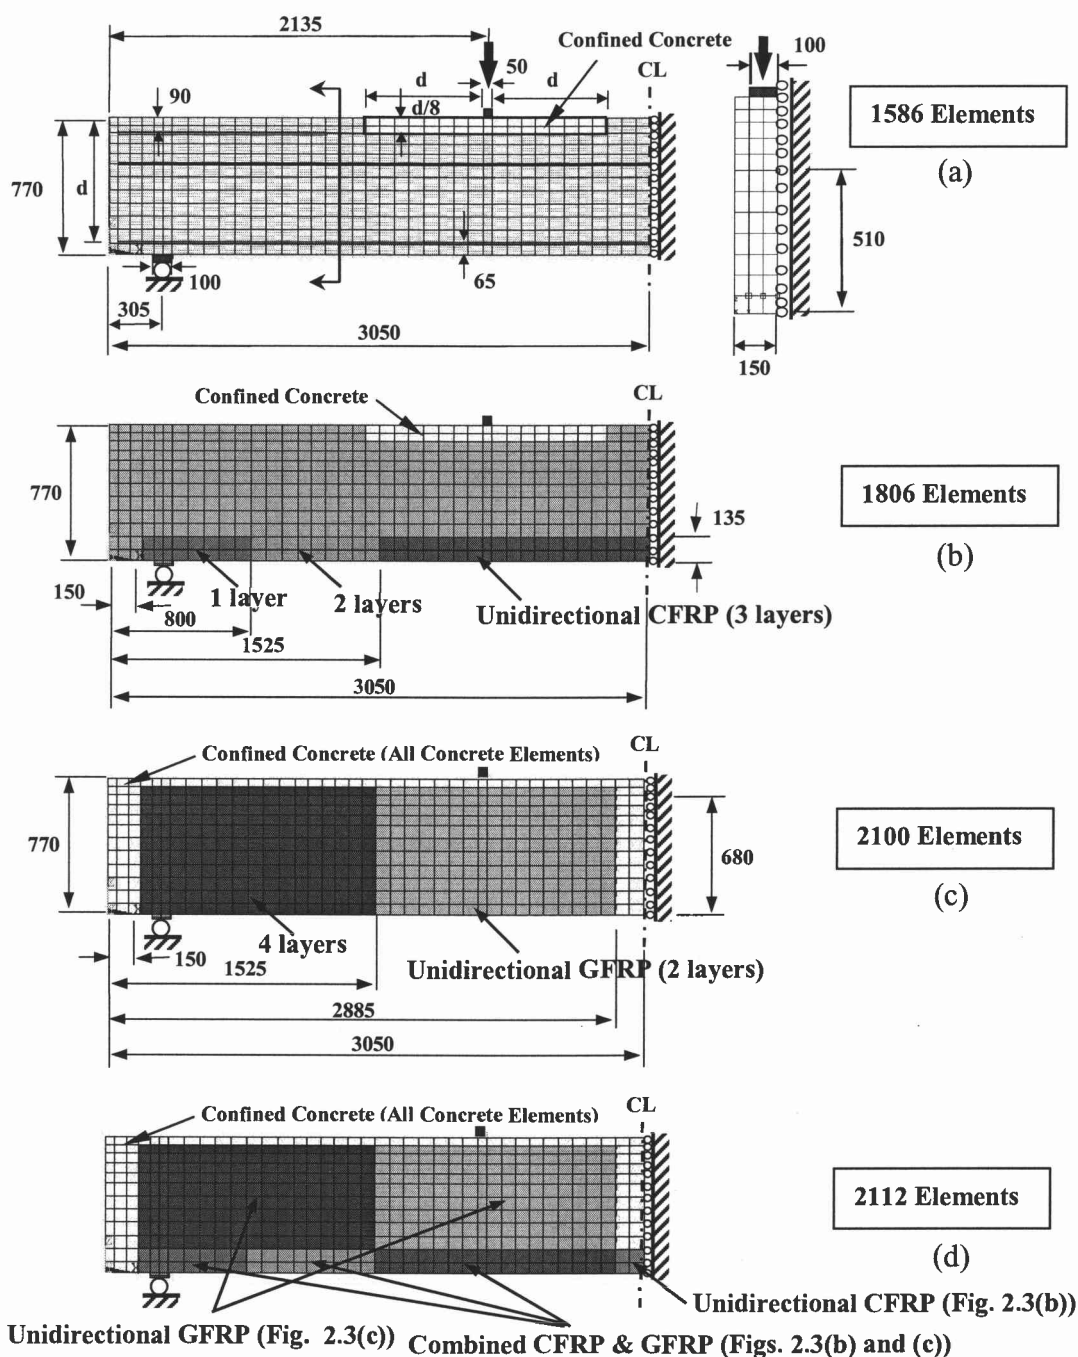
Finite Element Models (dimensions shown in mm): (a) Unstrengthened Beam; (b) Flexural- Strengthened Beam; (c) Shear-Strengthened Beam; (d) Flexural/Shear-Strengthened Beam
